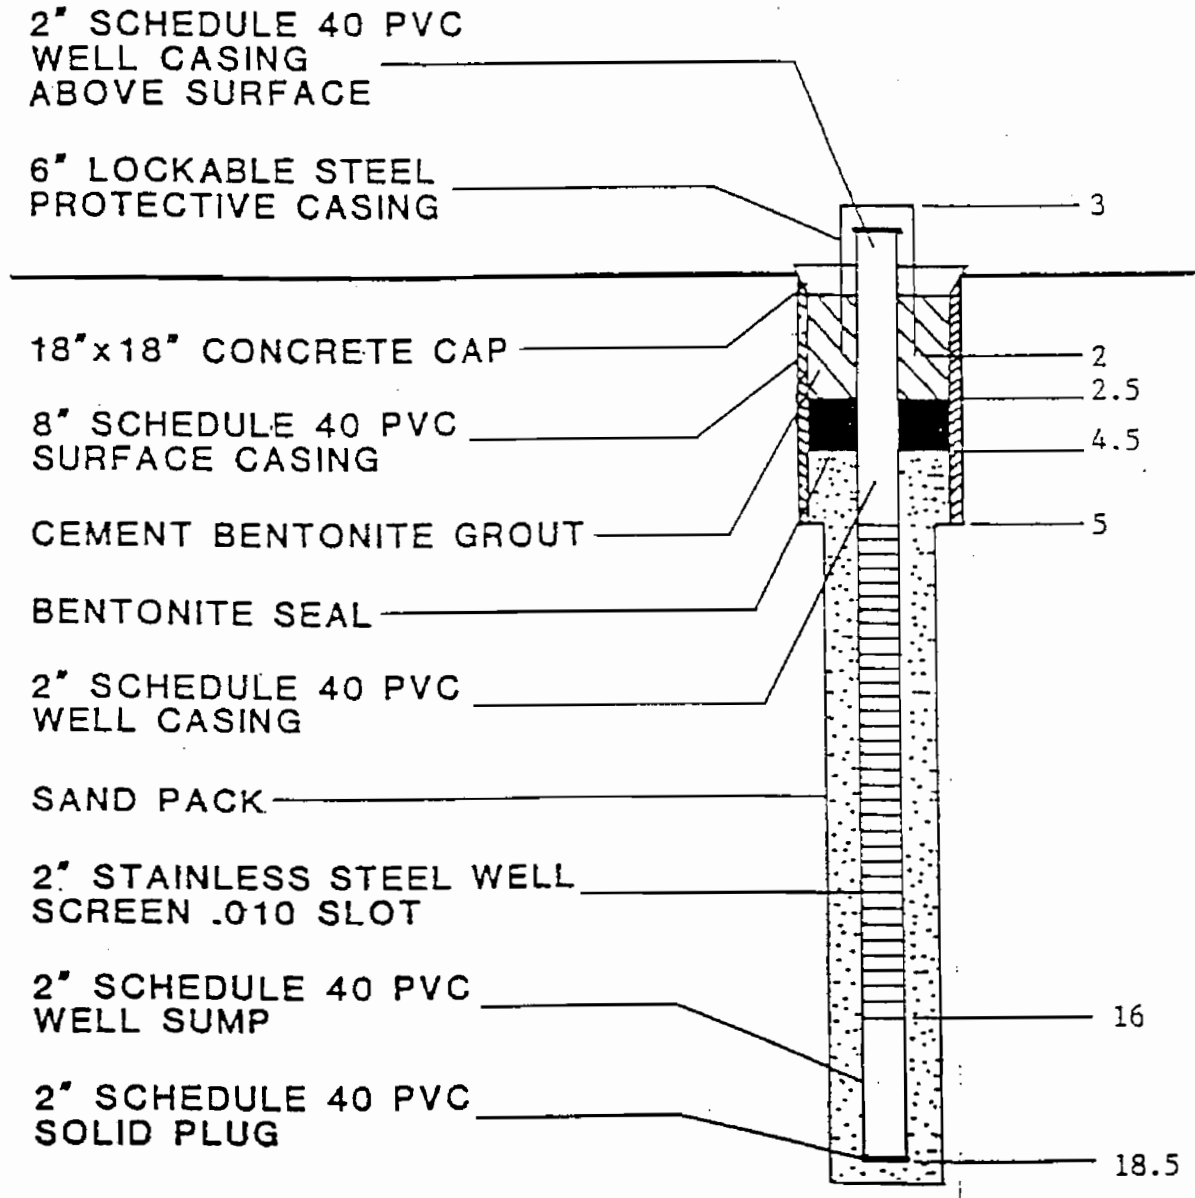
FIGURE : SHALLOW GROUND-WATER MONITORING WELL CONSTRUCTION DETAILS
